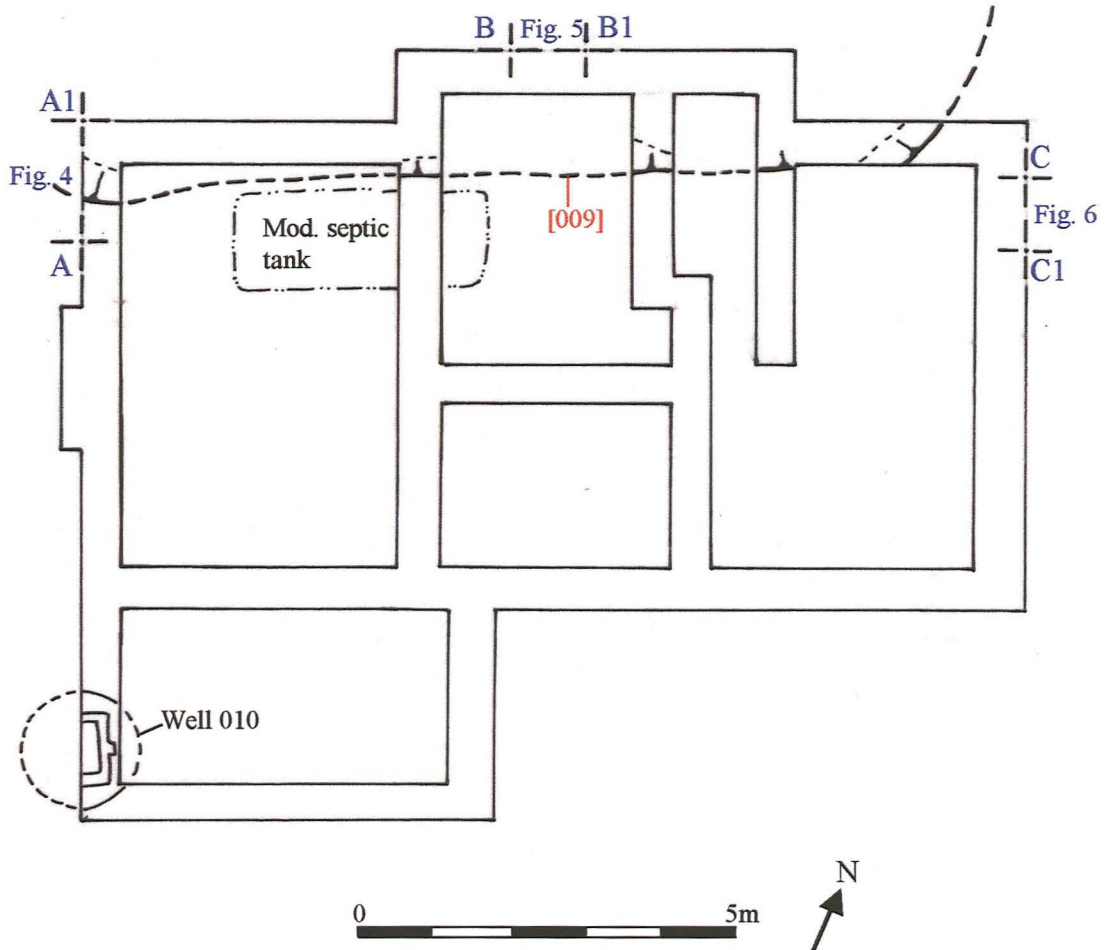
Plan of footings trenches, showing the location of recorded sections (Figs.4 – 6), and the projected line of the 'pond' [009]. Scale 1:100.
